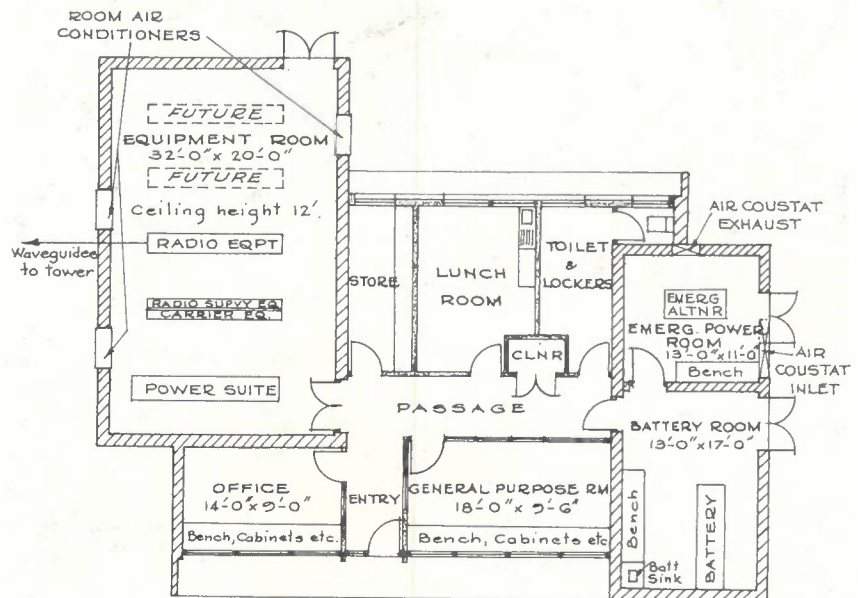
Floor Plan Typical Back to Back Terminal Station (Maryborough).
